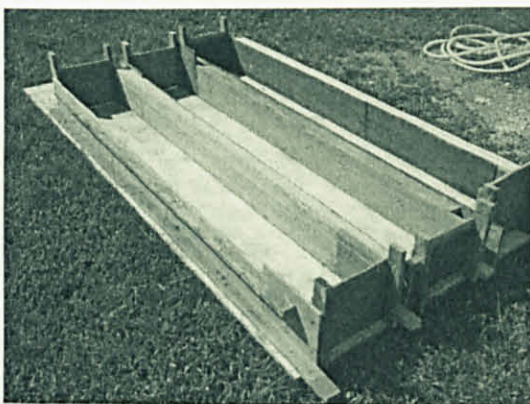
Completed form work of 3 beams to be cast on 1 plywood
